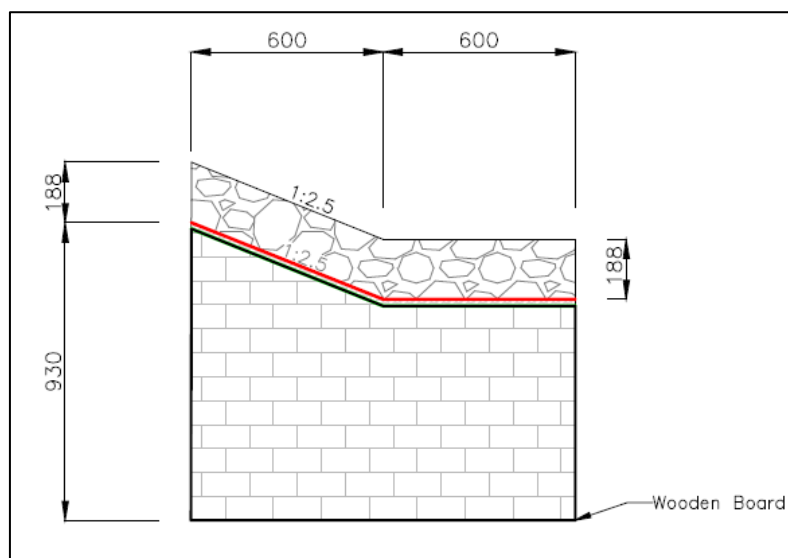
A typical longitudinal cross-section of a hydraulic model with steep (1:2) downstream (chute type) slope in the testing area. The model is in a 1.2 m wide flume with no tailwater control.
